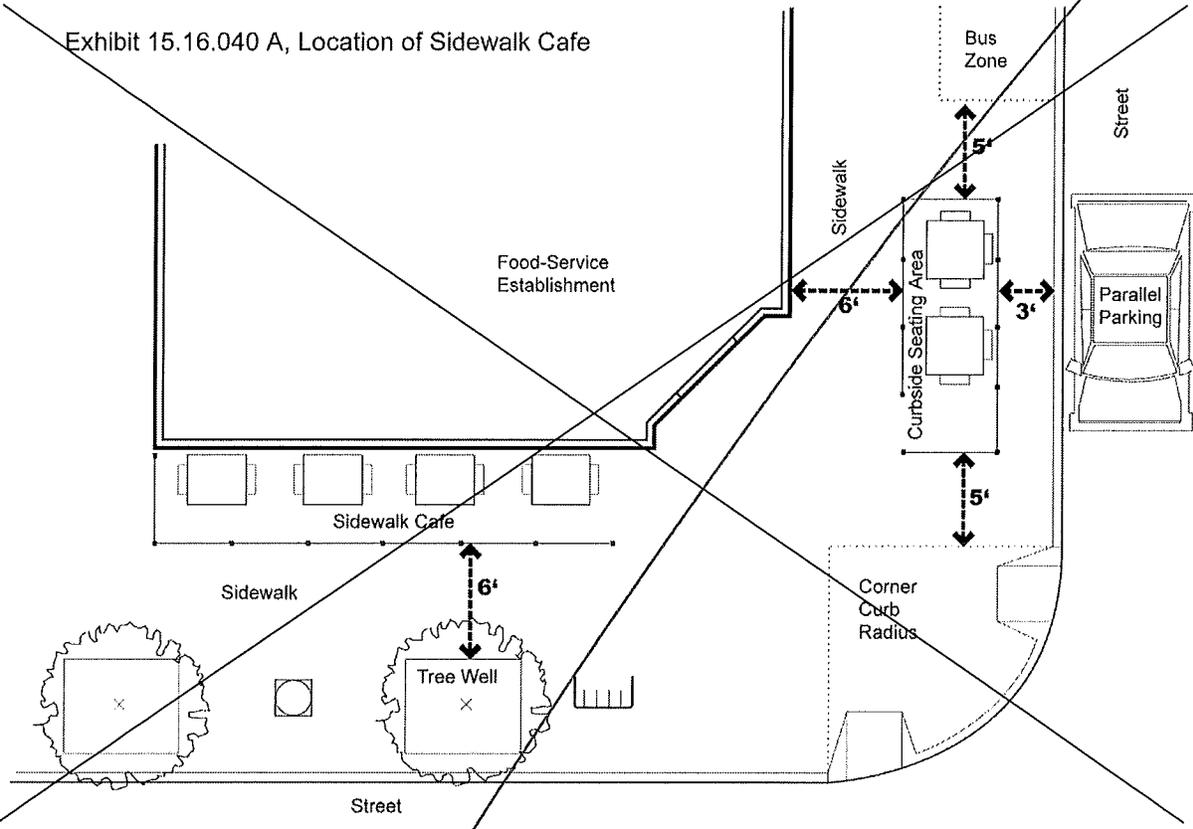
A, Location of Sidewalk Cafe
